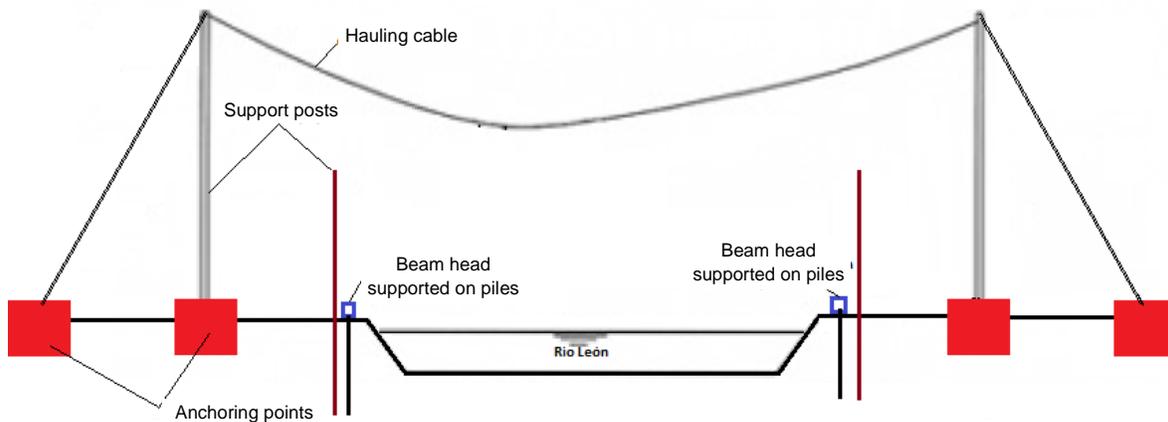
Longitudinal elevation support structure and arc starting
